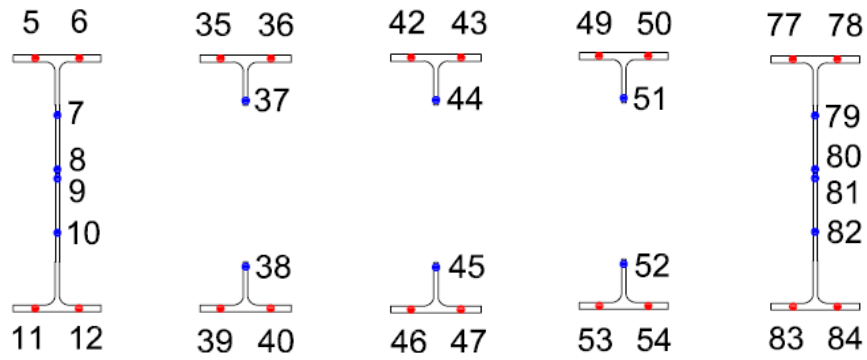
Beam 2 – selected steel sections: both ends and central zone
